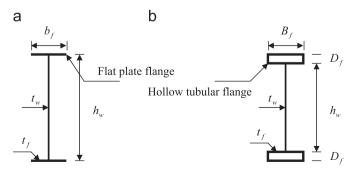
Definition of symbols of typical plate girders. (a): I-section plate girder (IPGs); (b): hollow tubular flange girder (HTFGs).
